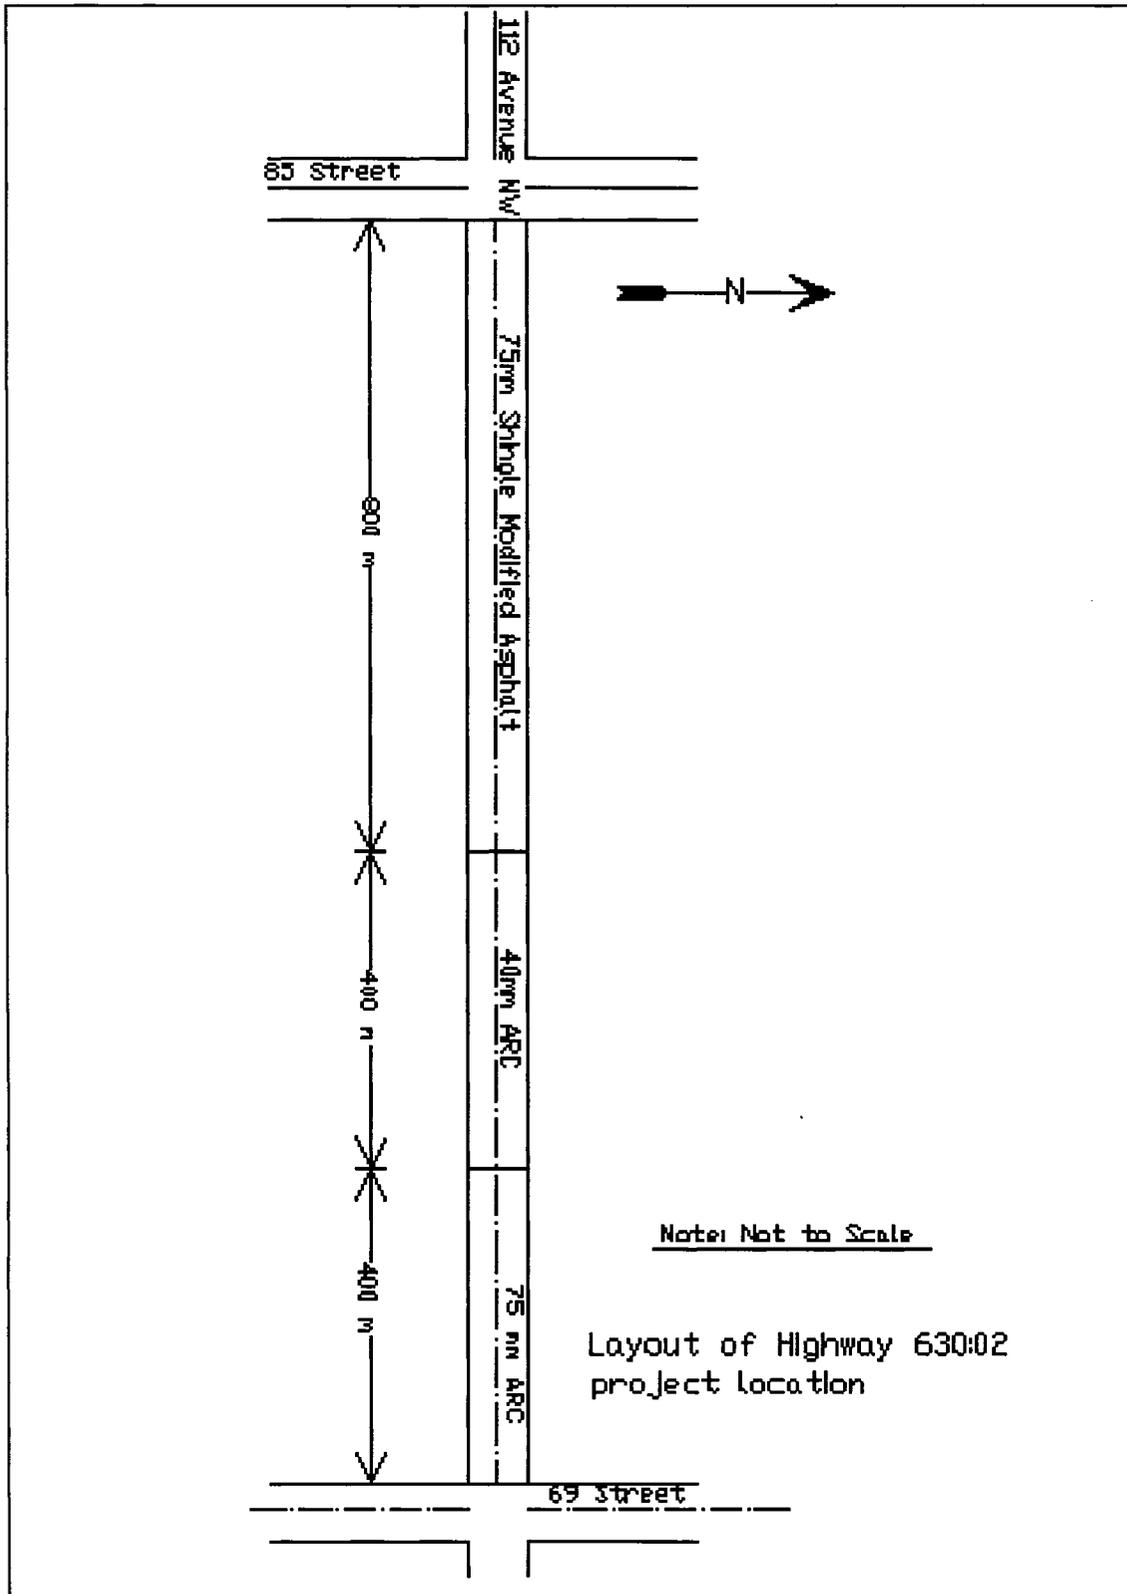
Layout of 112 Avenue NW Project (Calgary)
